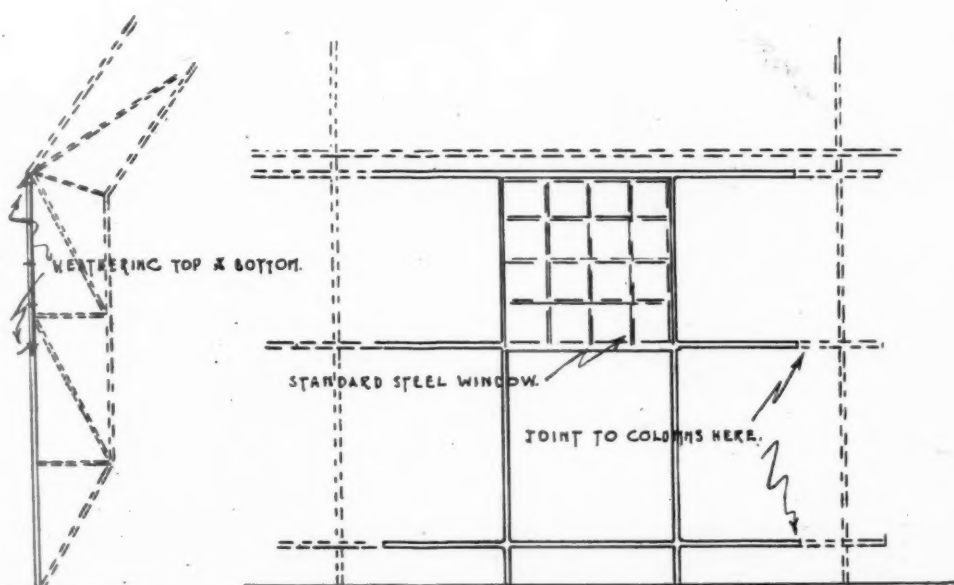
Light tubular construction incorporating composite roof truss and tubular columns.
